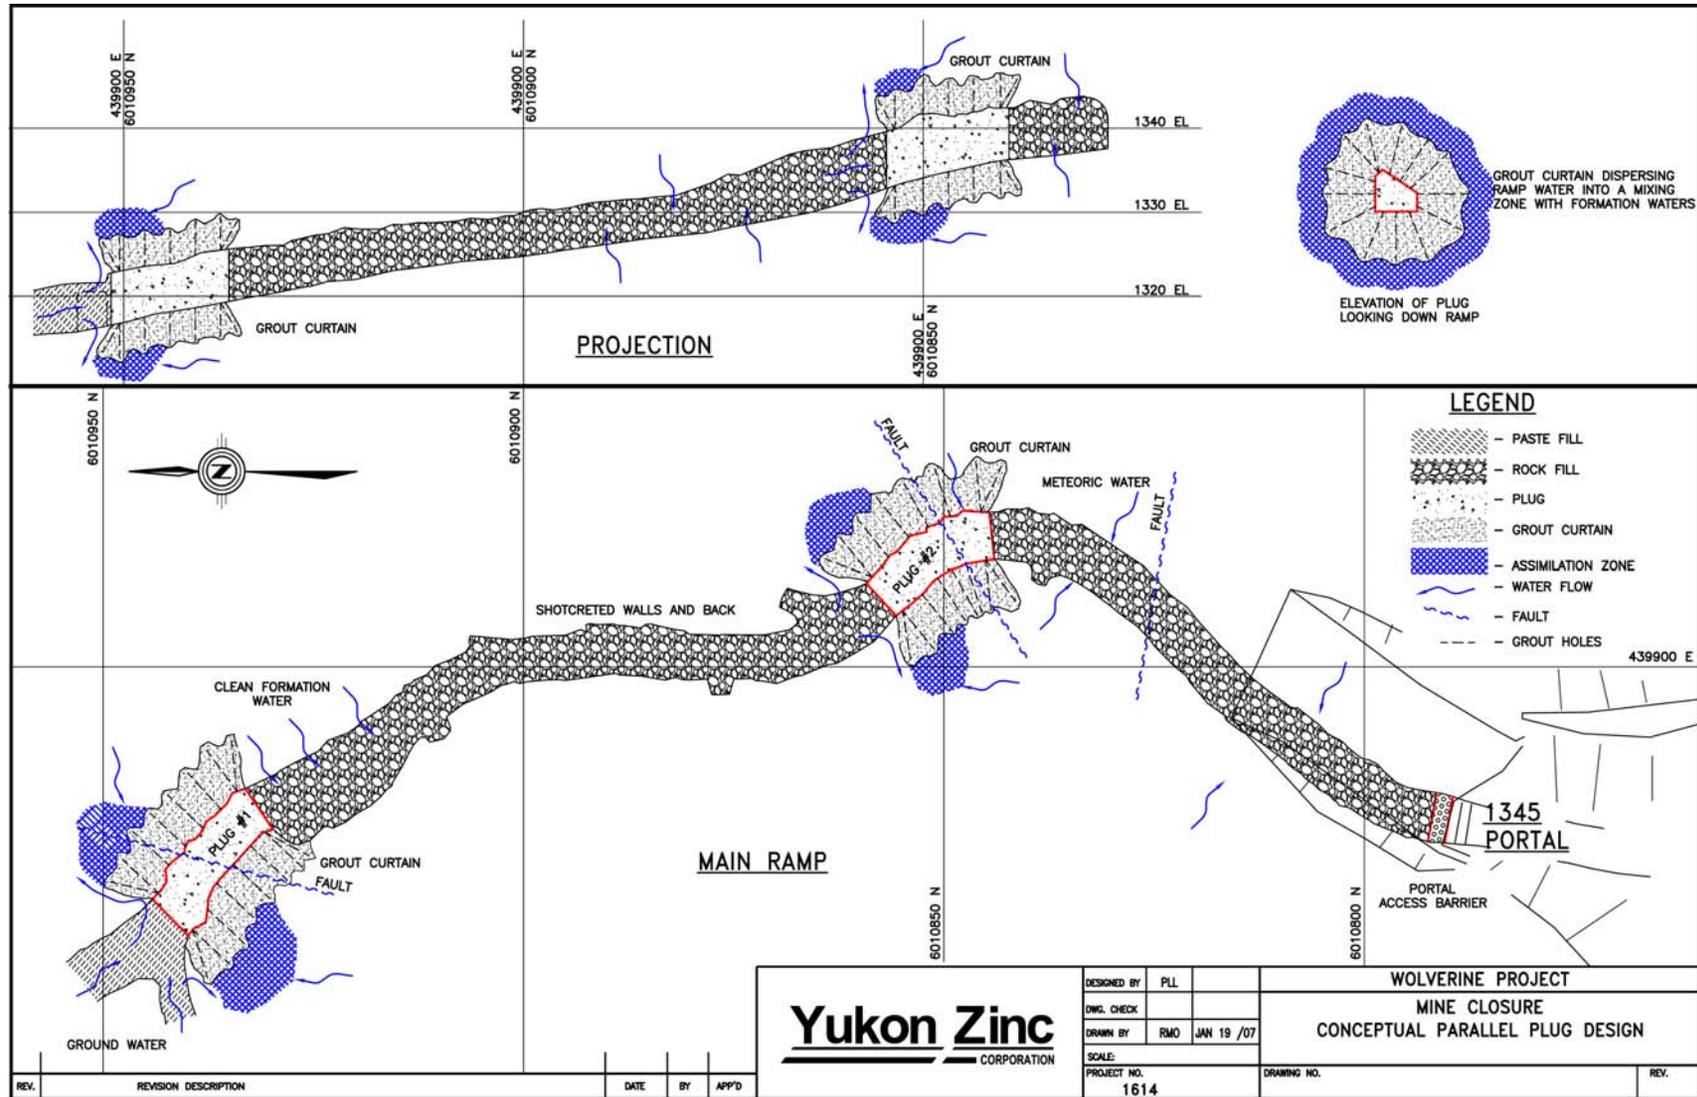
Parallel Hydraulic Plugs Conceptual Design in Underground Workings
